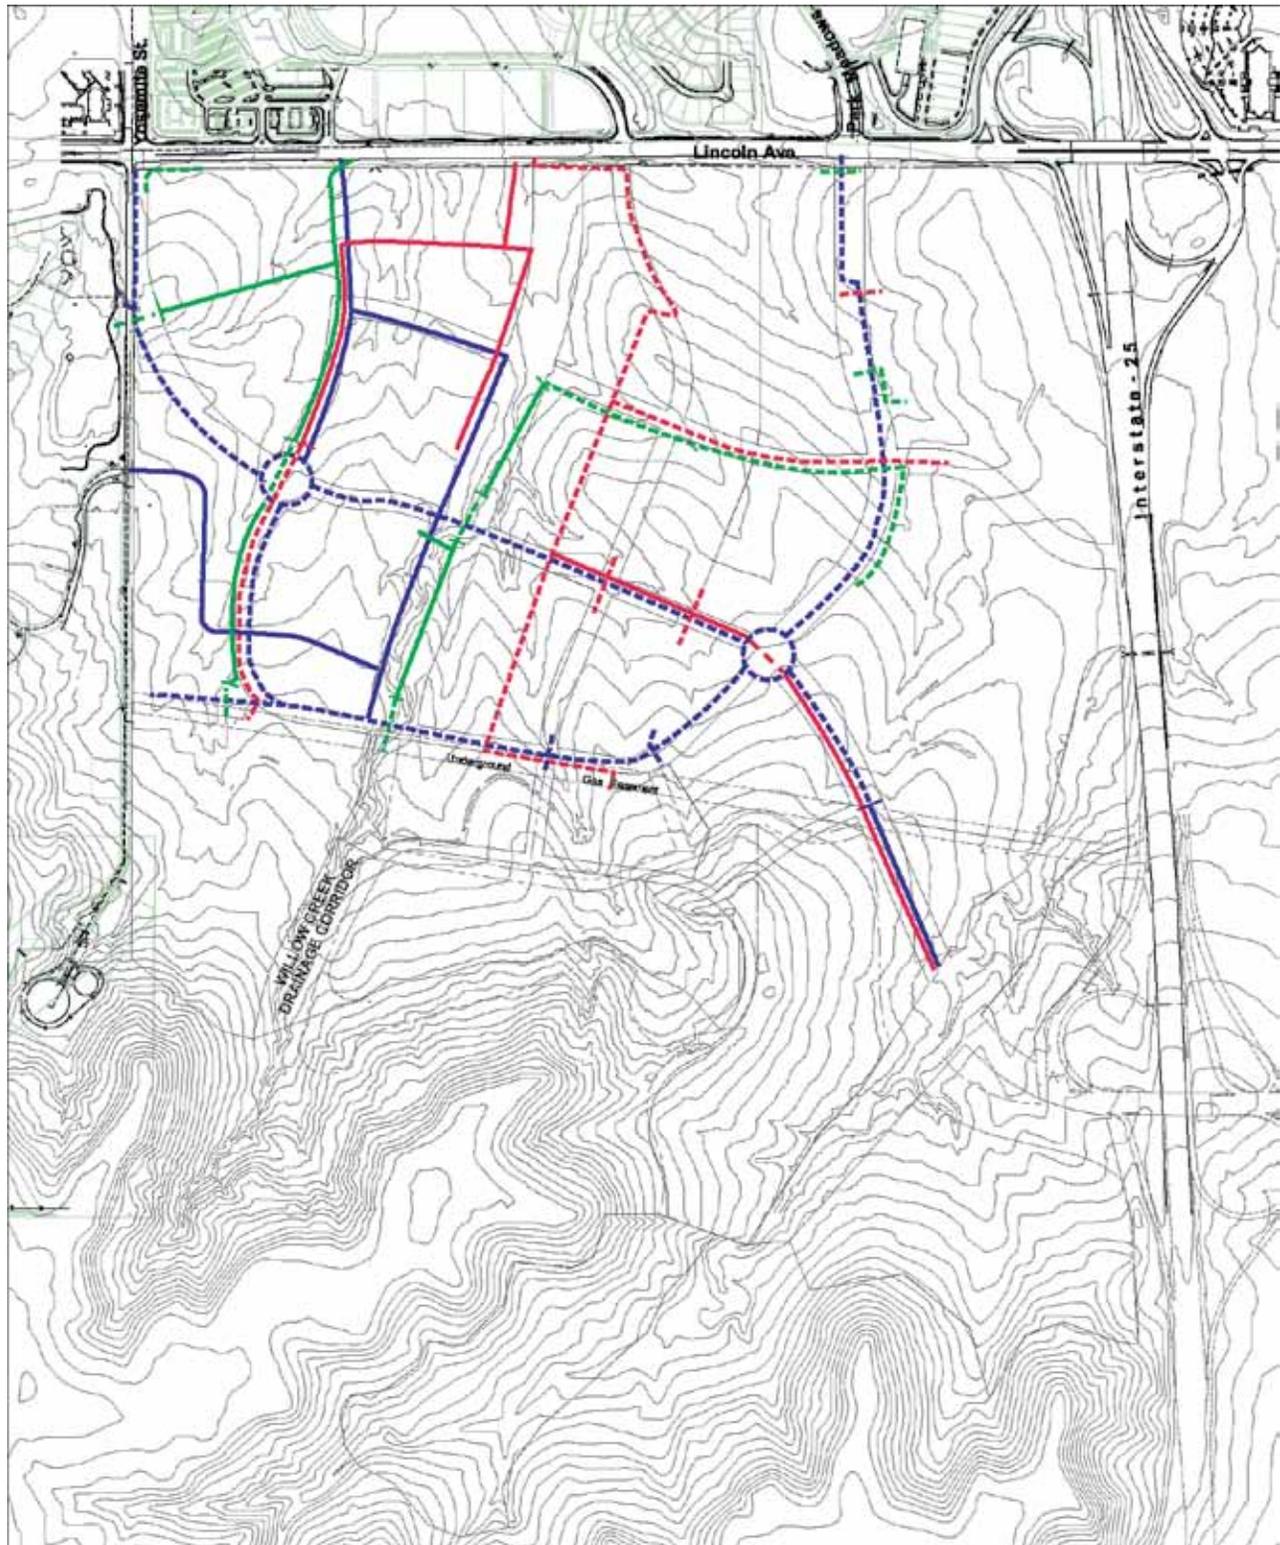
Section 15 Public Transportation Framework Plan
